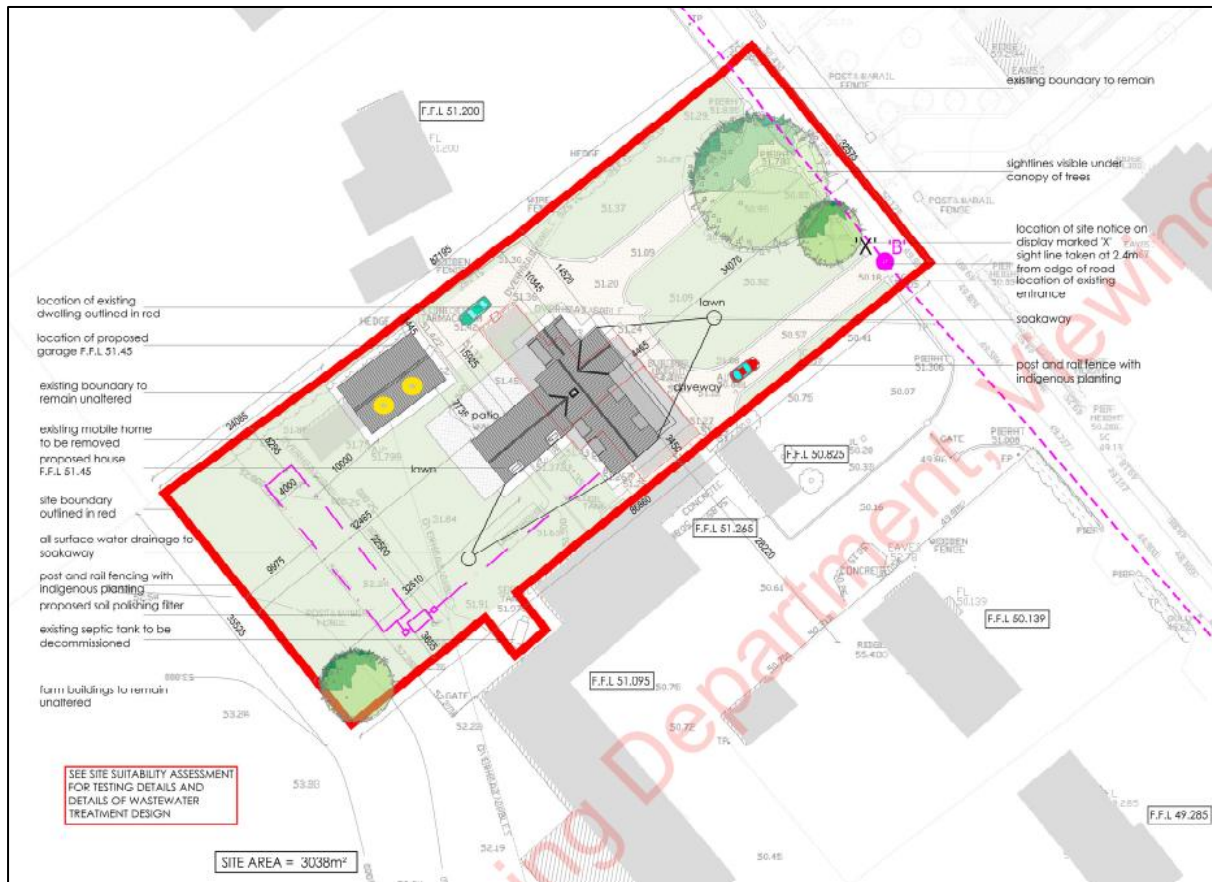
SITE LAYOUT PLAN SHOWING GARAGE LOCATION TO NORTH-WEST OF NEW DWELLING (APPROXIMATE LOCATION OF PROPOSED ACCESS SLATES/TILES SHOWN AS YELLOW DOTS).
